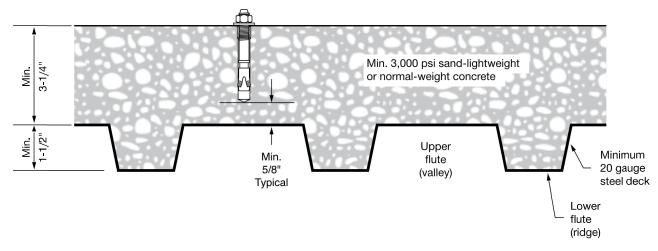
Installation of the KWIK Bolt TZ on the top of sand-lightweight concrete over metal deck floor and roof assemblies
